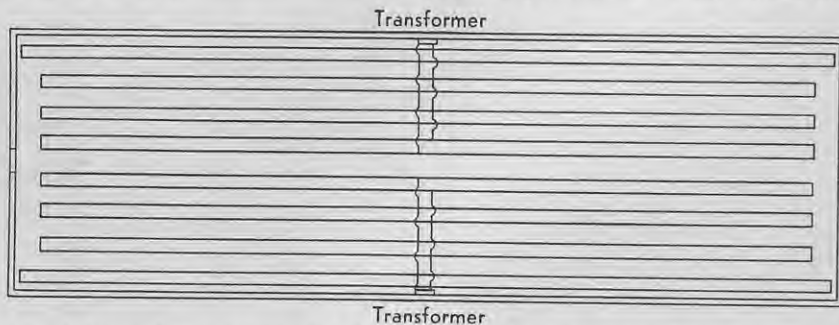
Plan of soil warming wire circuits for lengthwise planting of glasshouse and suitable for continuous or 10-hour power supply.
